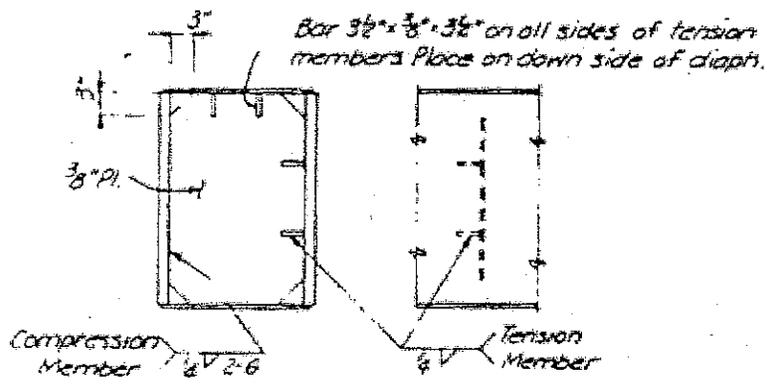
Welded Diaphragm Details in Main Truss Members from Original Contract Plans
